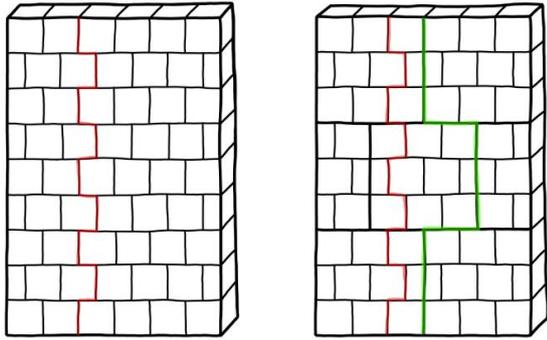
Bond(s) of masonry in traditional masonry wall and in wall of small-format precast units
